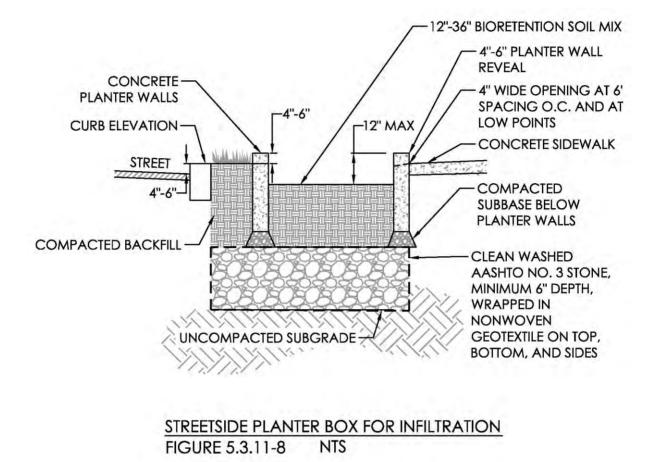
Example cross-section streetside planter box (cross-section B-B'). This planter box includes an underlying stone storage bed to increase storage capacity.
